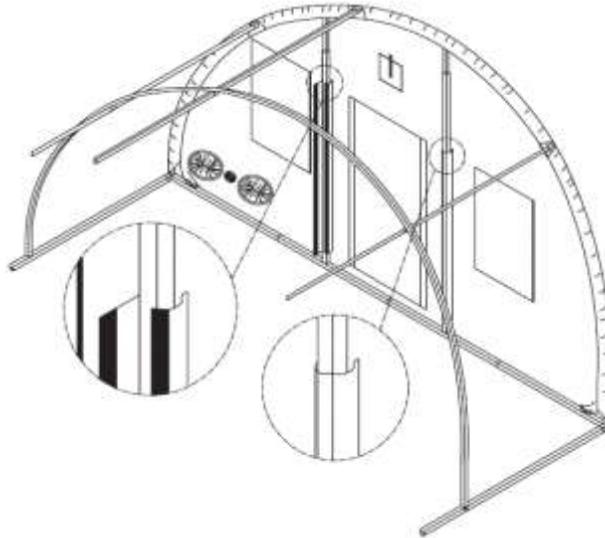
Zippered End Panel Attachment to End Uprights.
